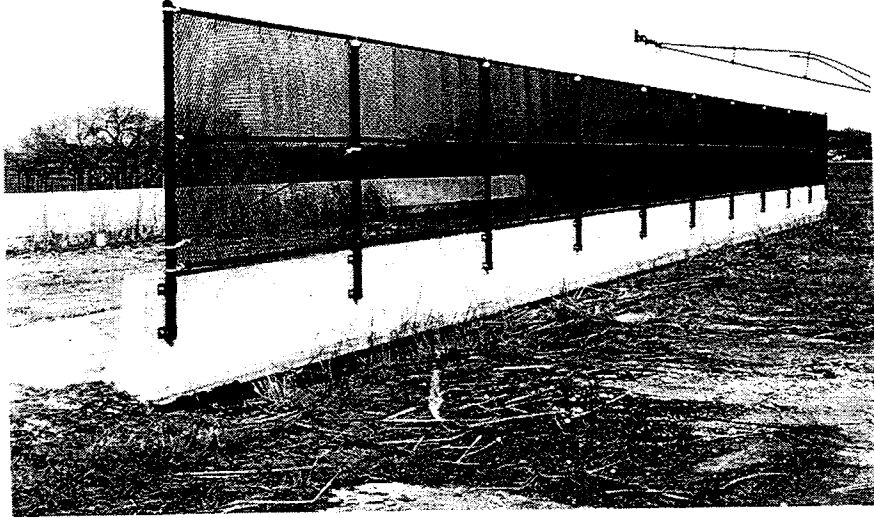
Vandal protection fence on the New Jersey safety shape bridge railing.
